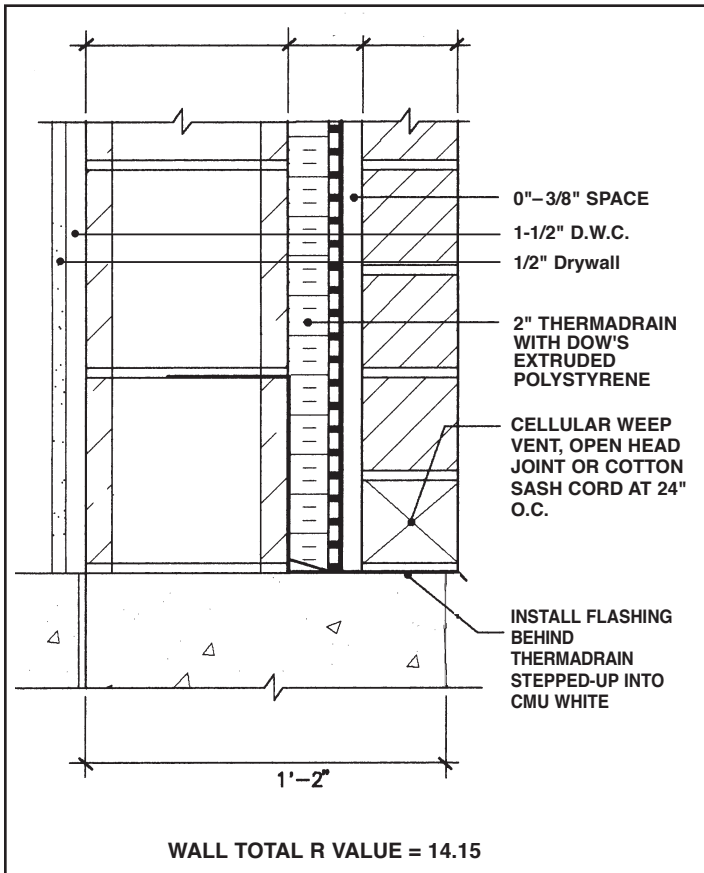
Typical *ThermaDrain*<sup>®</sup> wall section
